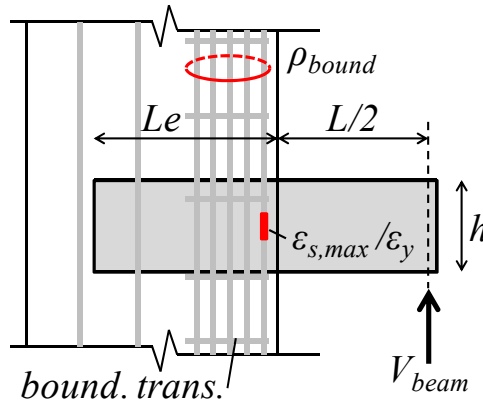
Structural Wall Cross-Section for Second Sub-Assembly (SRC3 and SRC4)
